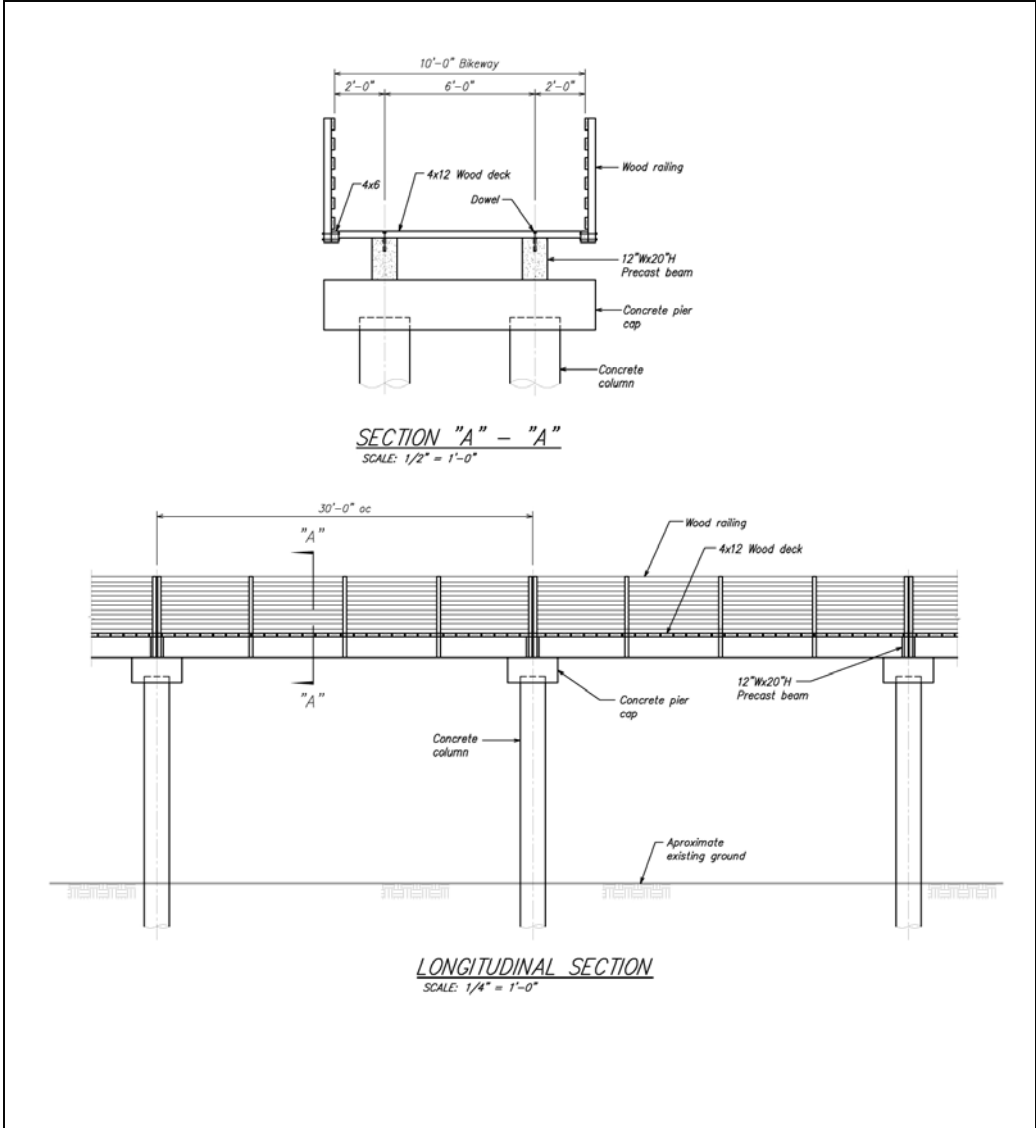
Option three – Elevated bridge with wood/Trek deck on concrete columns
